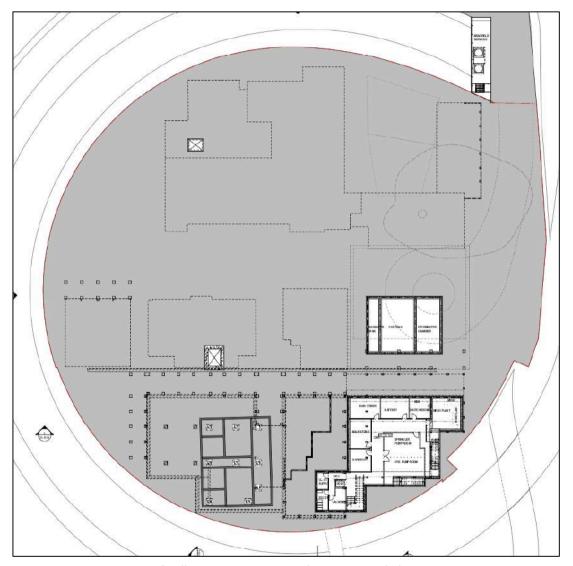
Locations of Bulk Excavation - Proposed Lower Ground Plan (Source FJMT, 18.12.19)
